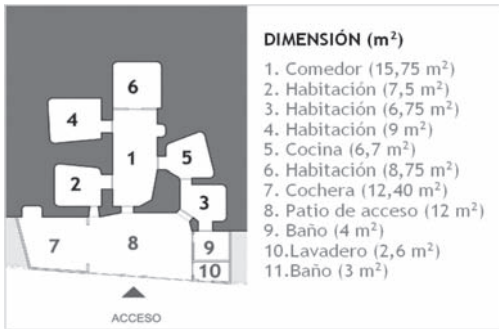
Main floor of an excavated house in the CAVE + ATTACHED CONSTRUCTIONS typology. Image of the author.
